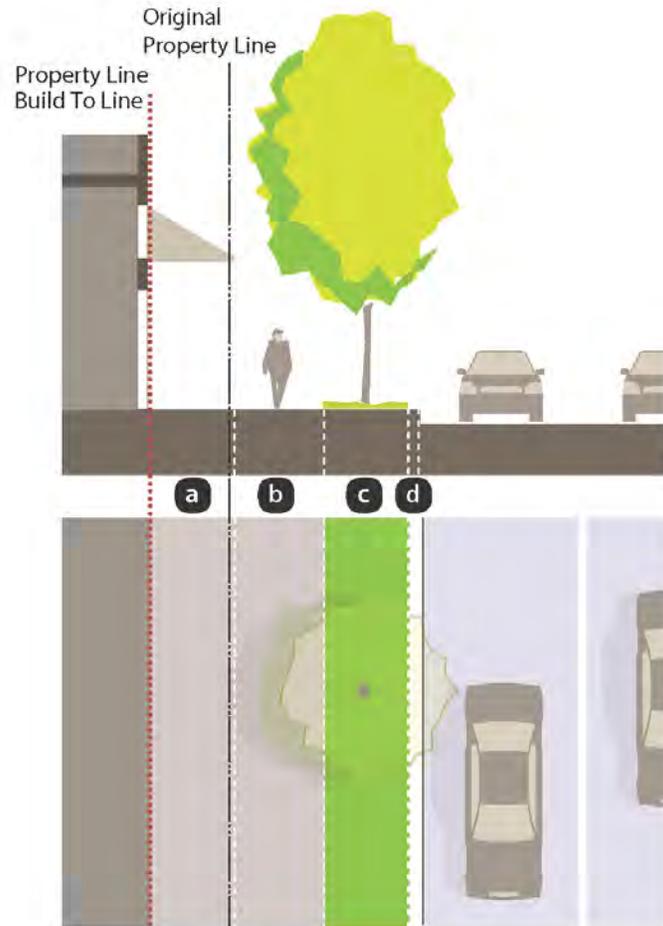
, Pacific Avenue Sidewalk Improvements
